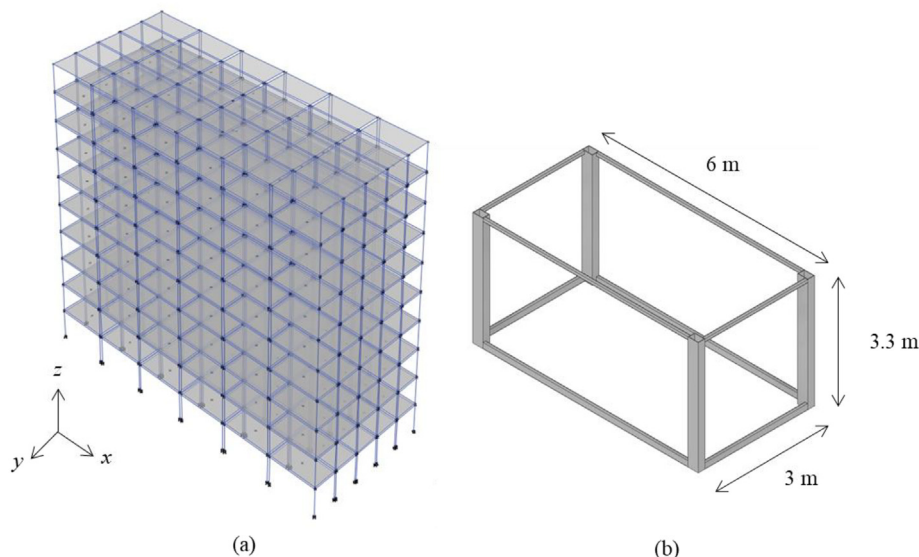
(a) 10-storey unbraced modular building, and (b) single module.
